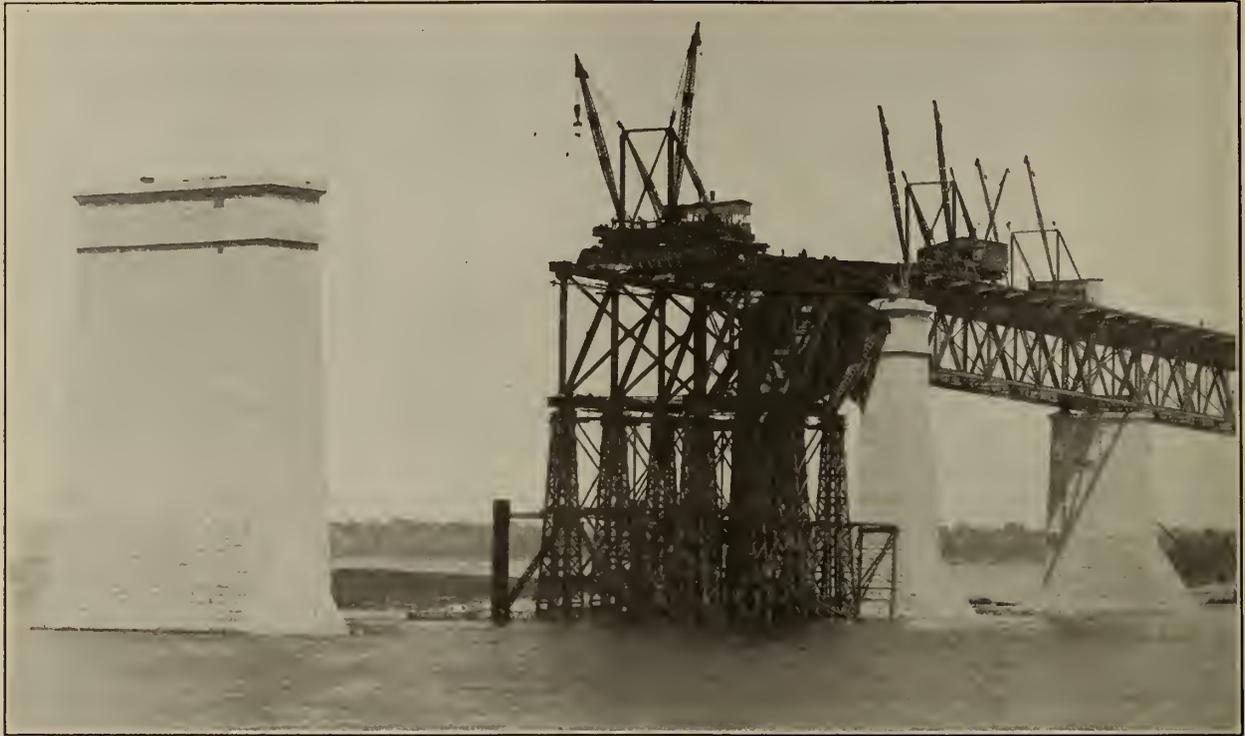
Main Span, South Side—Erecting Falsework Span under Anchor Arm—First Stage.
